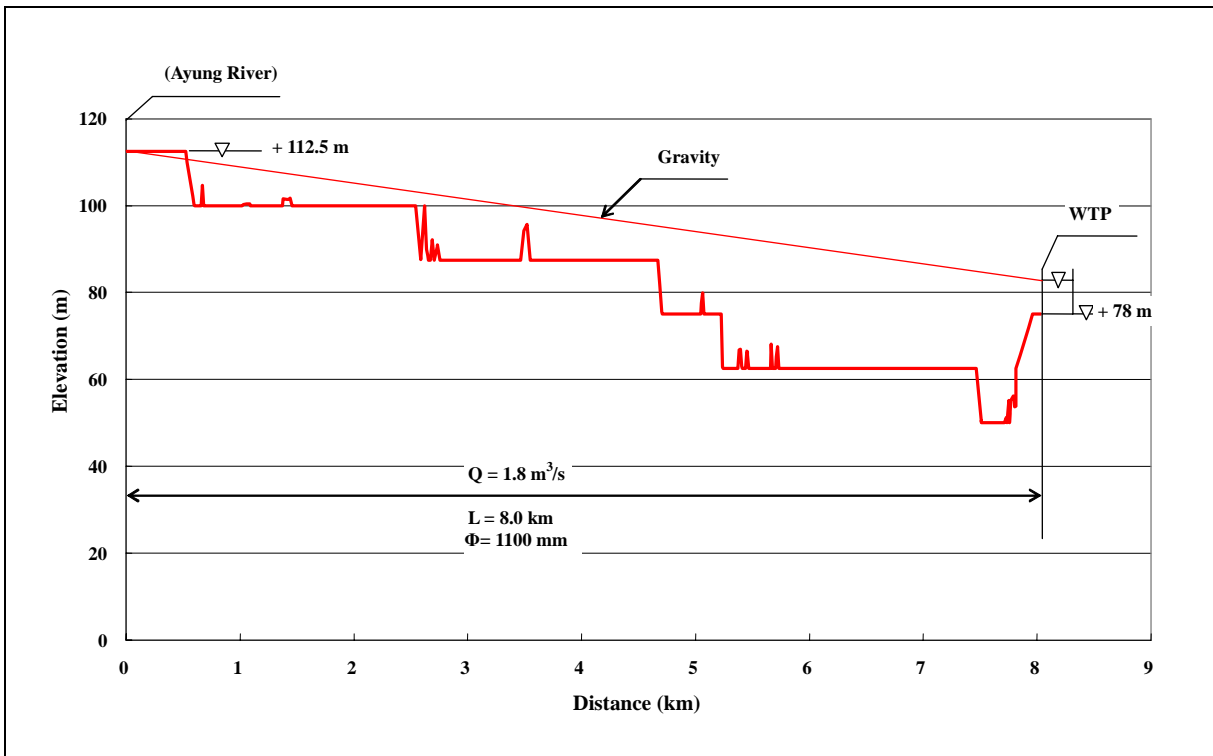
Longitudinal Section and hydraulic Gradient Line of Alternative C1
